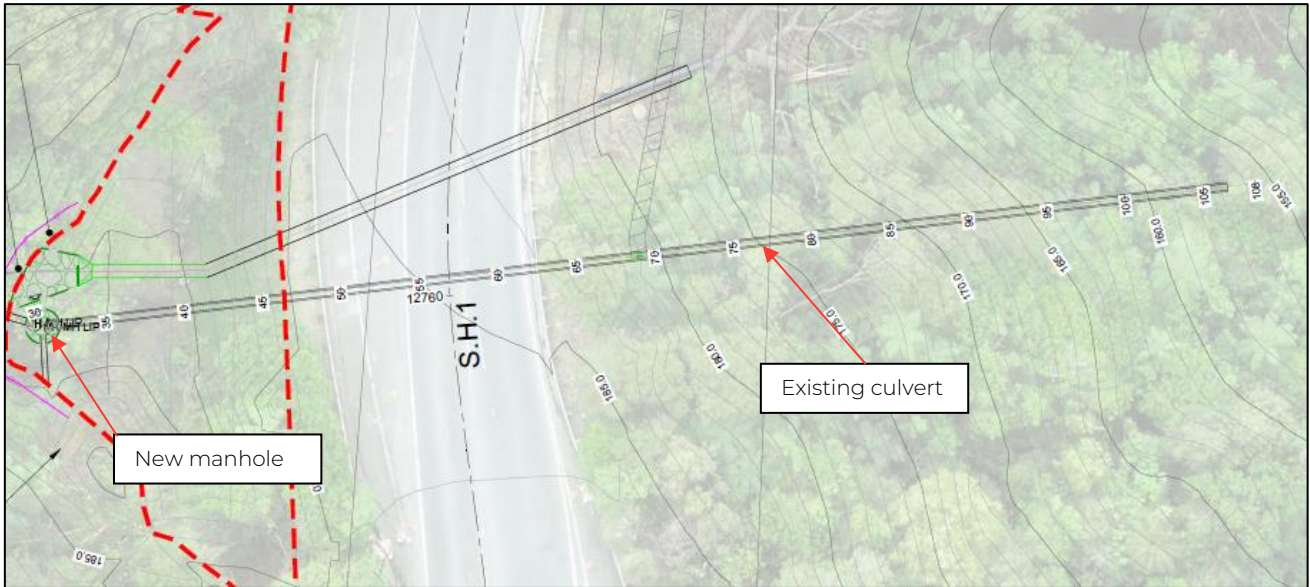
Site F1 existing culvert shown in black and new extension and manhole in green.
